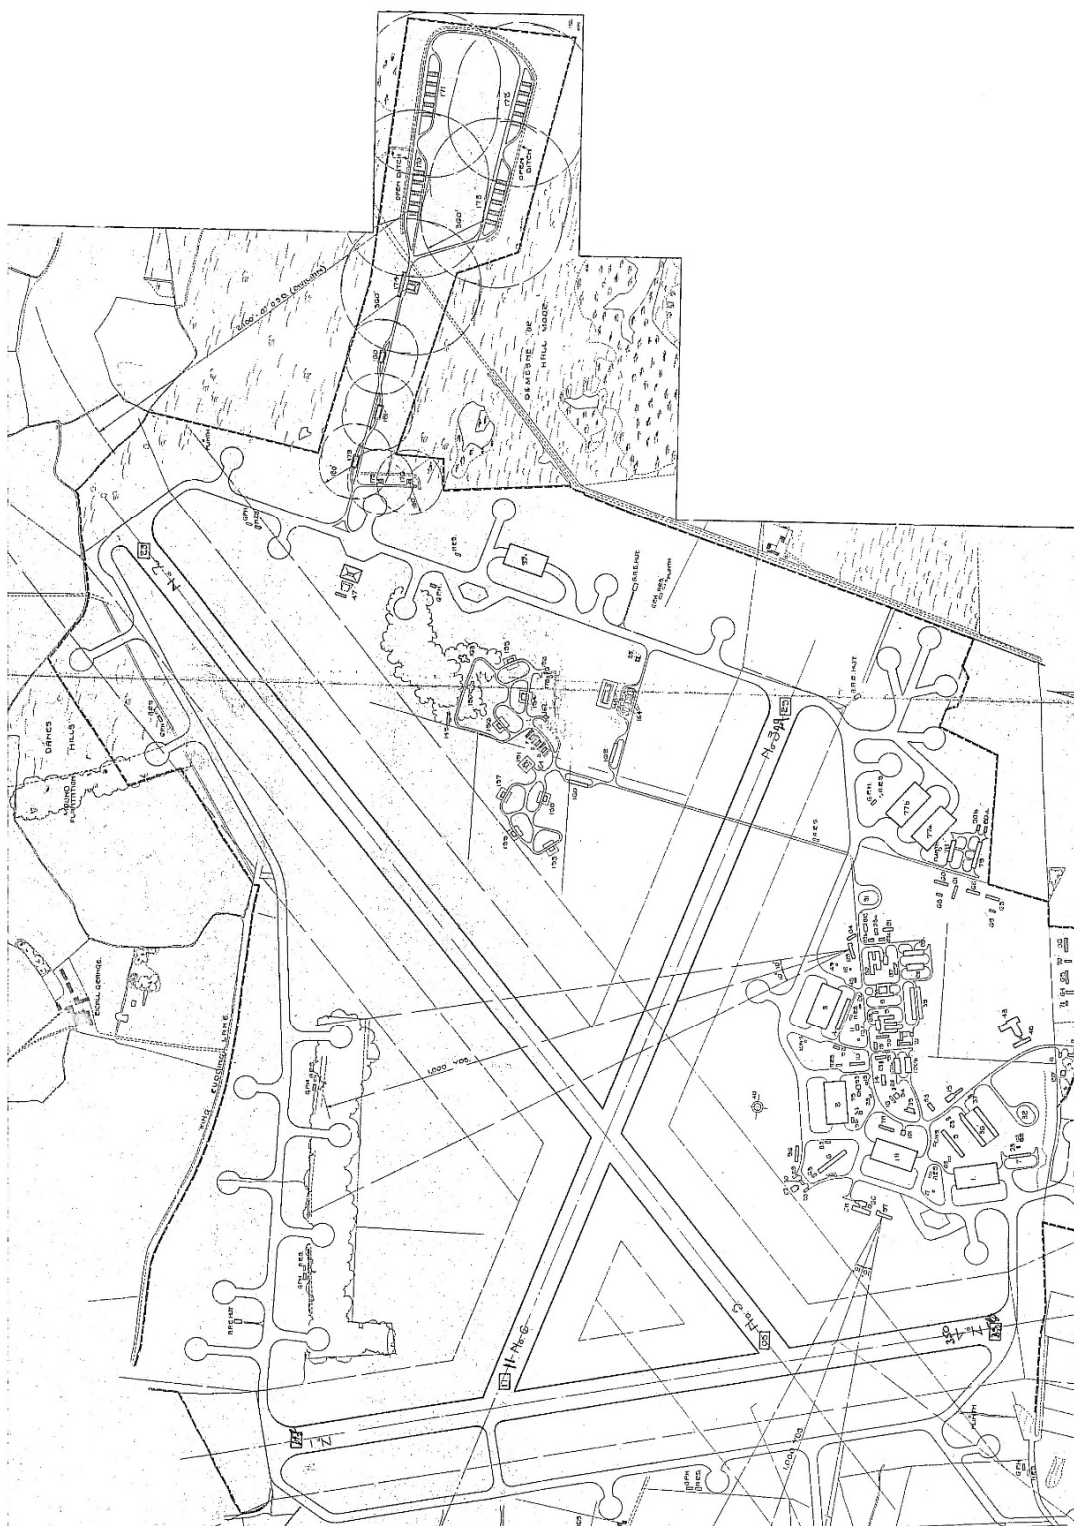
Riccall Airfield Layout Plan – 1945 (Drawing No. 5116/45)
